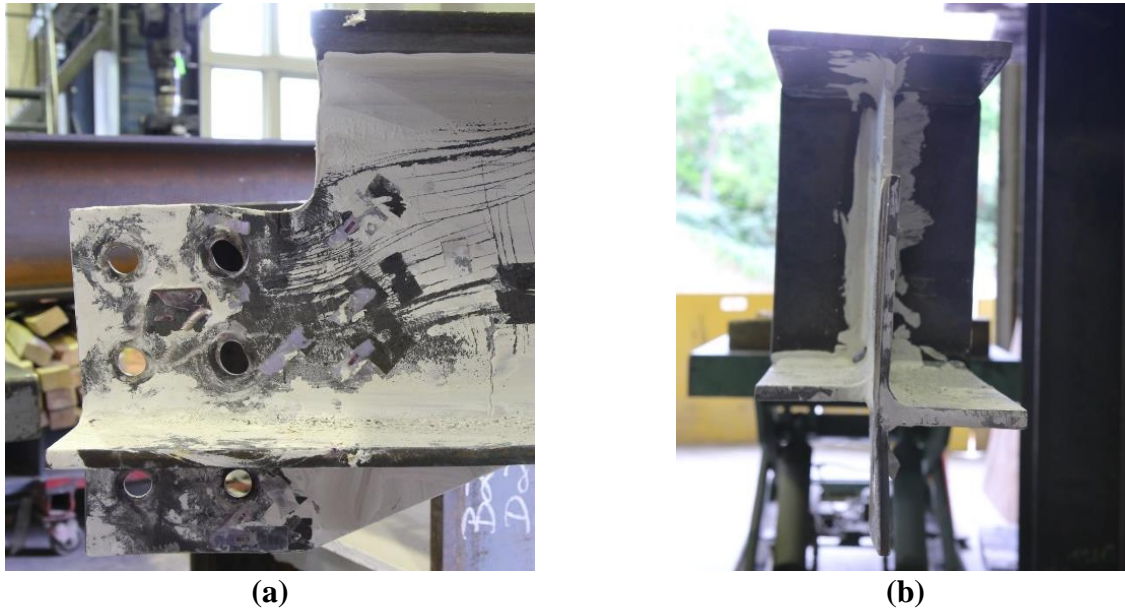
Deformation in Specimen 7 (haunch) (a) cope damage and bolt hole bearing; (b) out-of-plane deflection of beam
